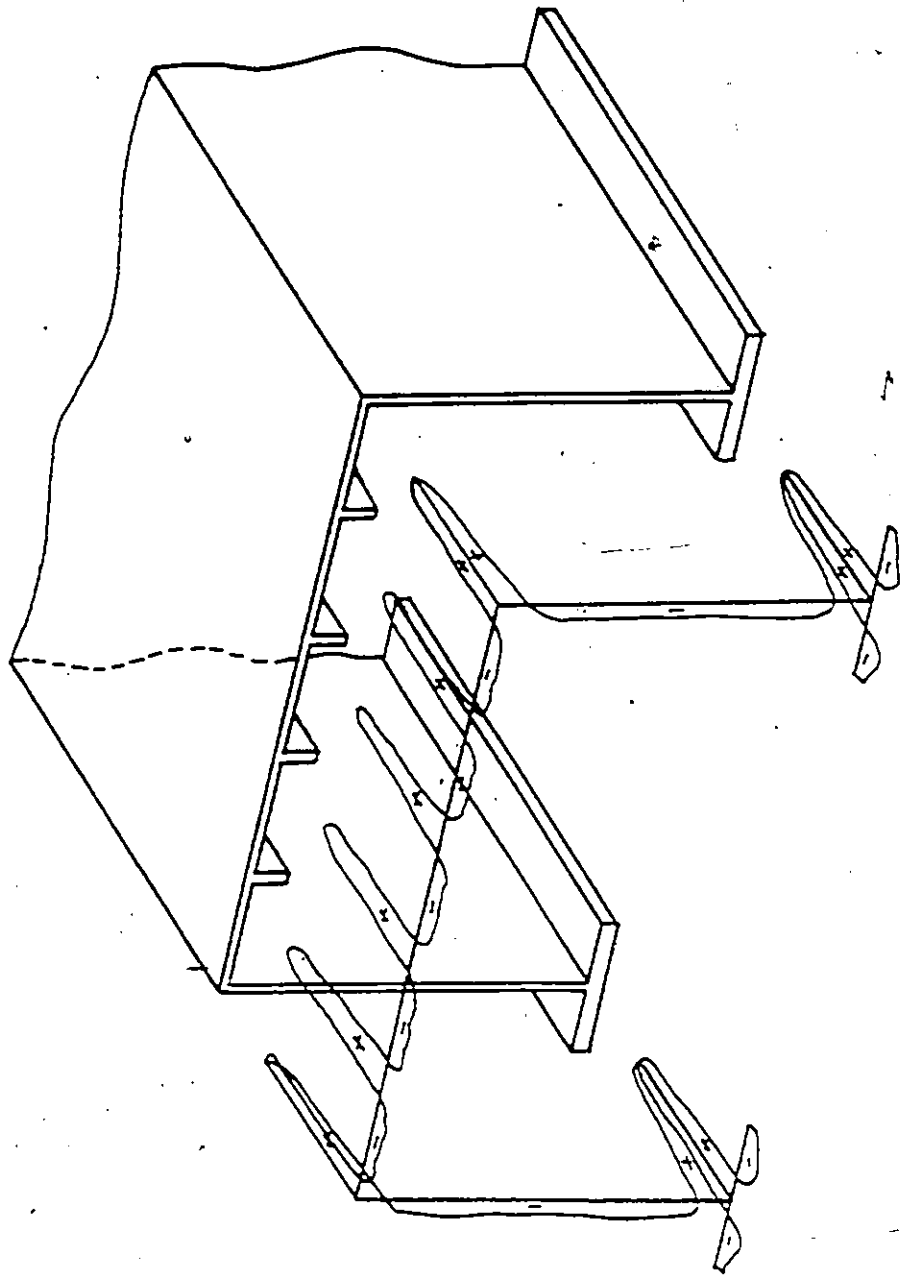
Typical Distribution of Longitudinal Residual Stresses in Steel Box Girder
